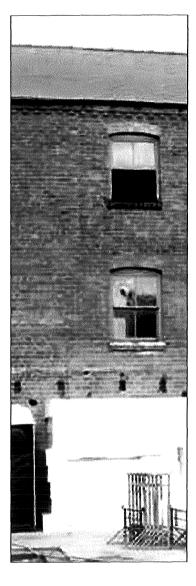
Brickwork of first phase Walton Works and second phase Crescent Works stitched together. The join was well constructed and not easily visible
